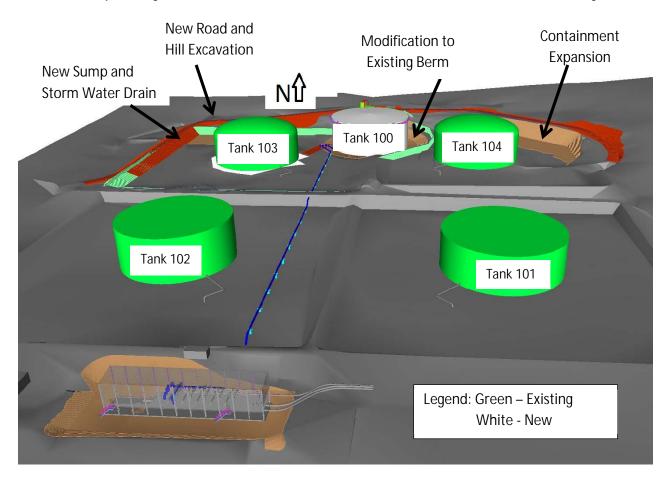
Sumas Terminal Construction Scope Elements
